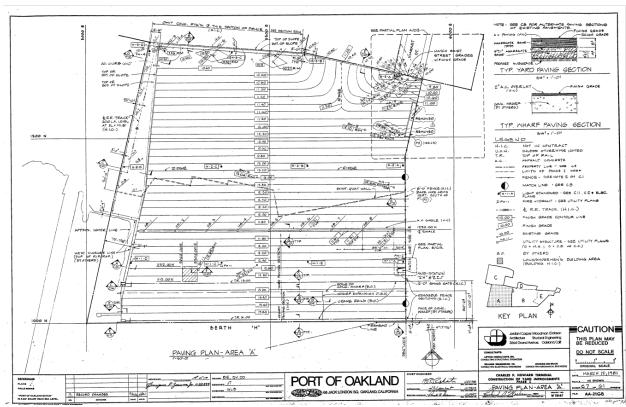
Sheet C-7 of Howard Terminal Yard As-Built Drawings (AA-2168, dated 1981) shows partial plan of wharf deck and backlands pavement.
